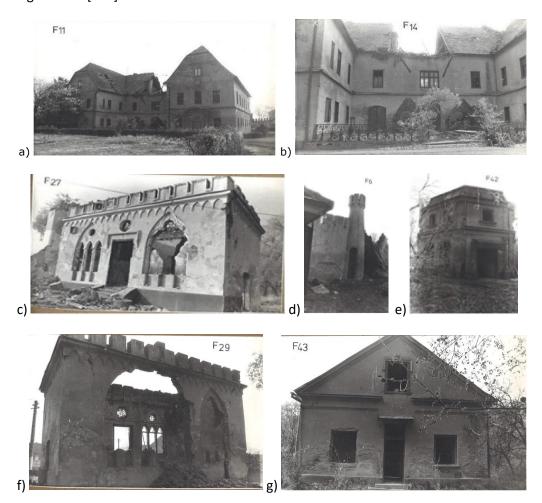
Damages to masonry buildings in the epicentre of Banloc earthquake, 1991 [170]
